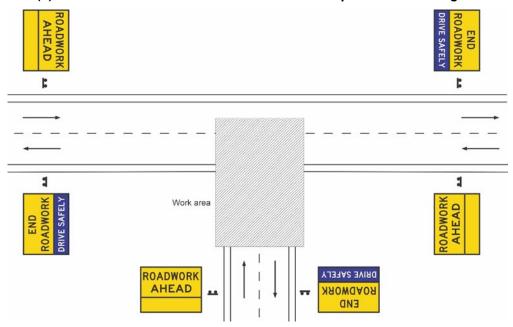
(c) – Roadworks on a 'No Through Road' or 'Cul-de-sac'
